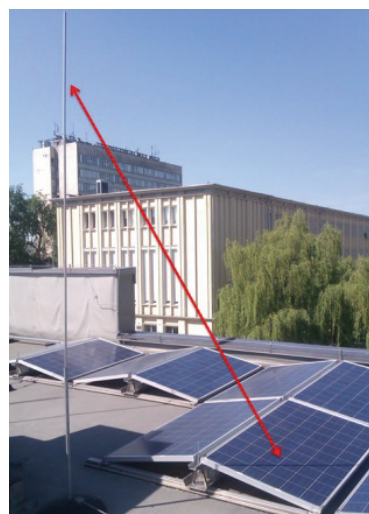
The view of a lightning rod casting a shadow on photovoltaic installation
